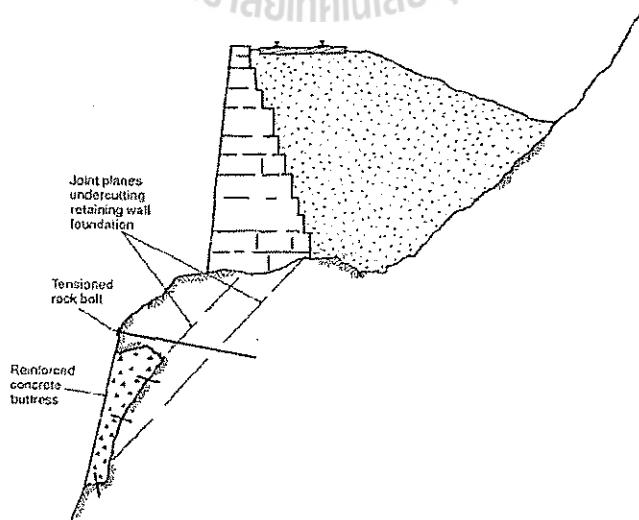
Retaining wall foundation stabilized with reinforced concrete buttress and rock bolts.
